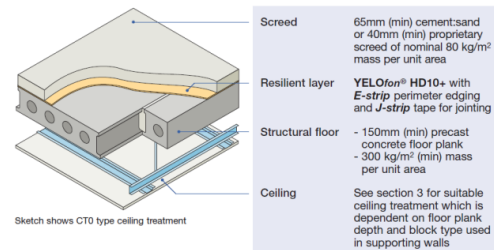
E-FT-3 (Timber) & E-FC-5 (Concrete) Floor Constructions[114].
